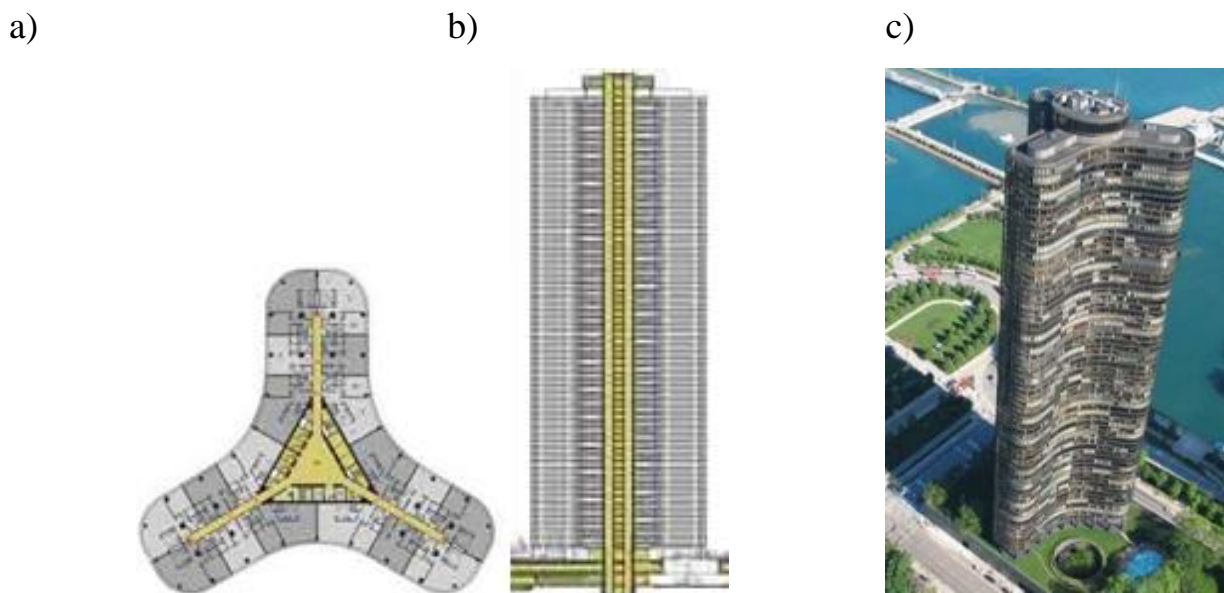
High-rise residential building "Lake Point Tower":
